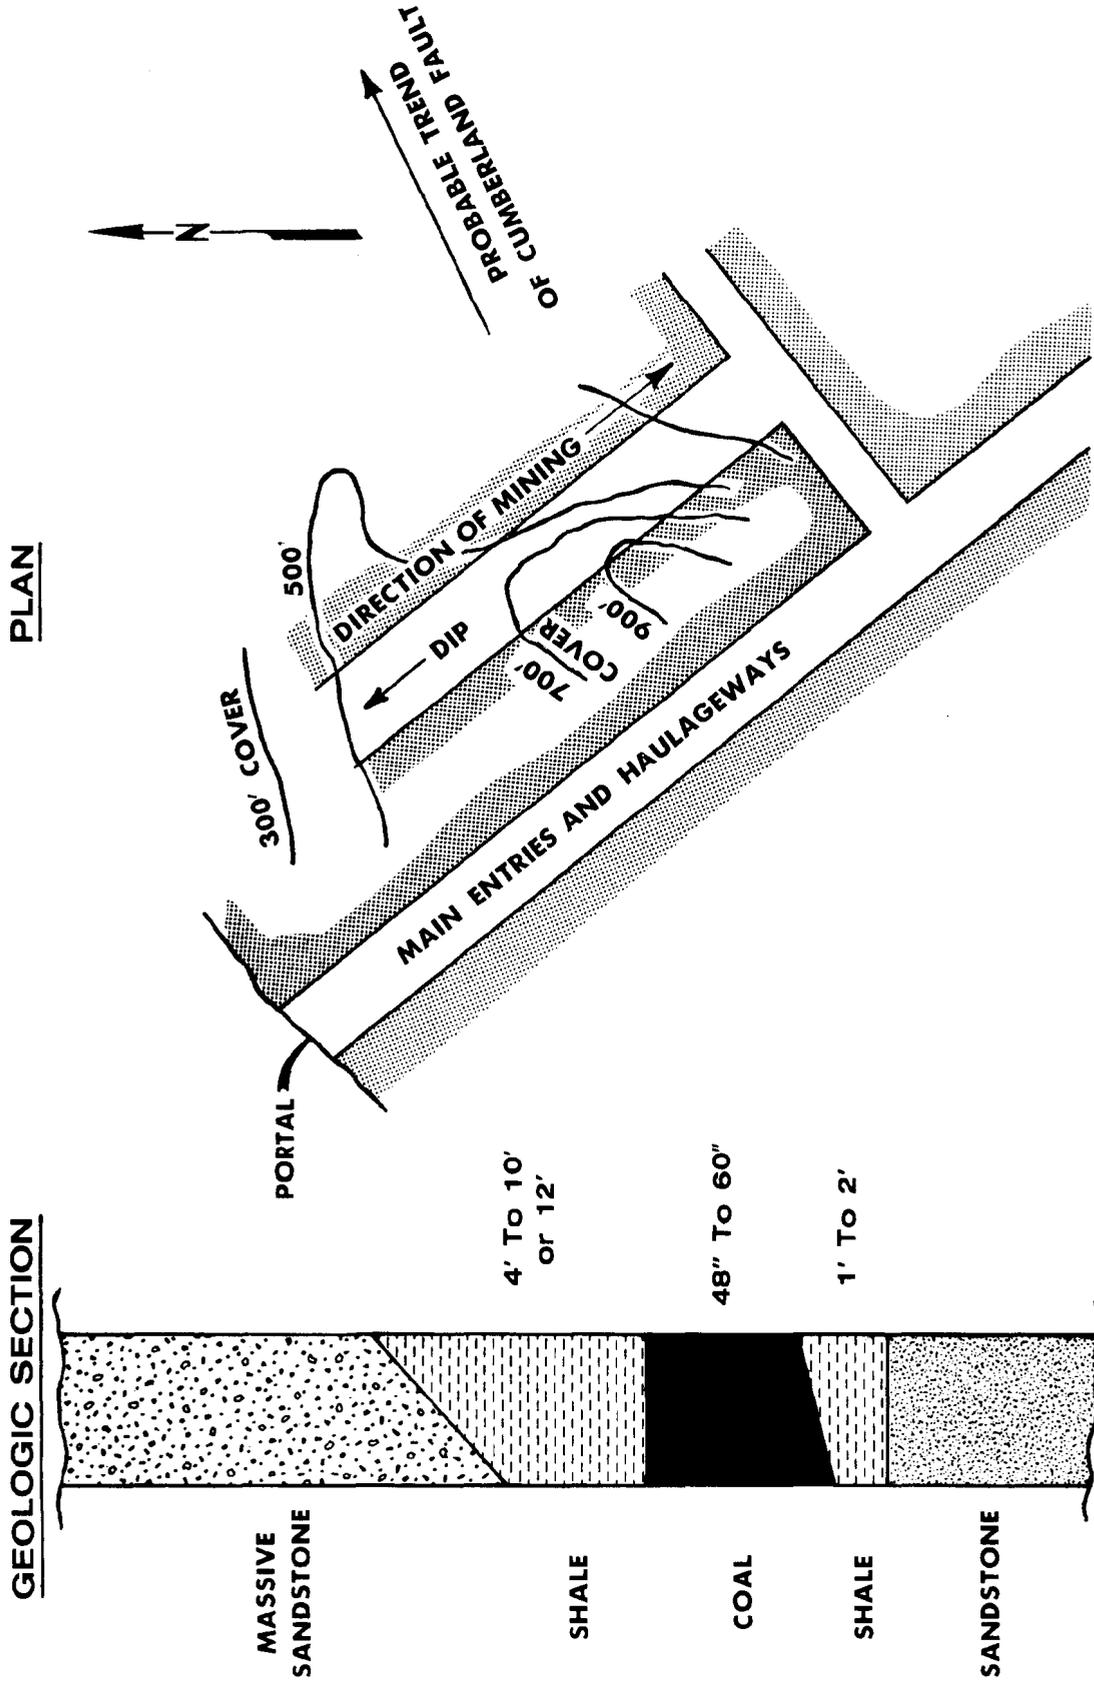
Mine VaB - Geologic section and plan layout.
